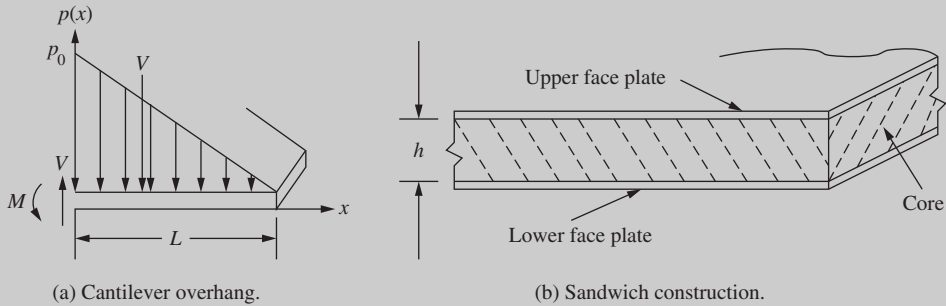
Triangular snow loading of sandwich constructed building overhang.
